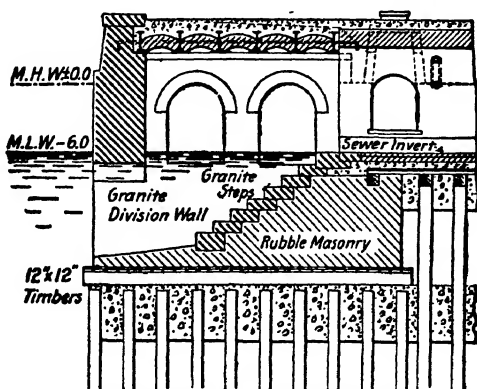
Outlet of Broadway outfall sewer, Borough of the Bronx, New York.
